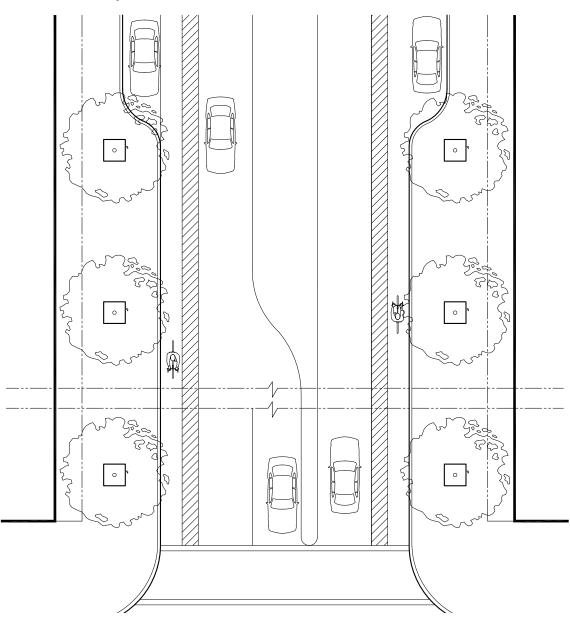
Street Type 2: Connector Street – Typical Intersection (Plan Perspective)
